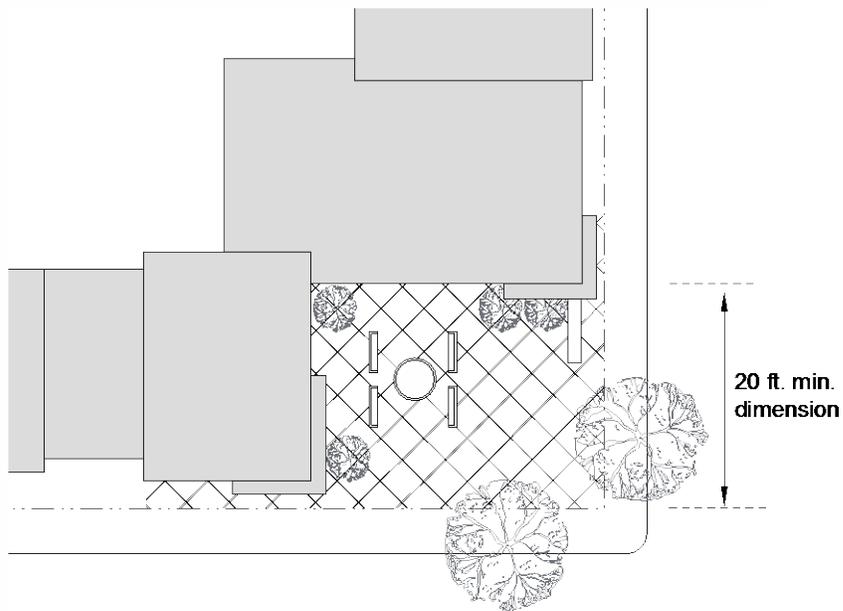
D.1.c: MINIMUM REQUIRED PUBLIC PLAZA DIMENSION
